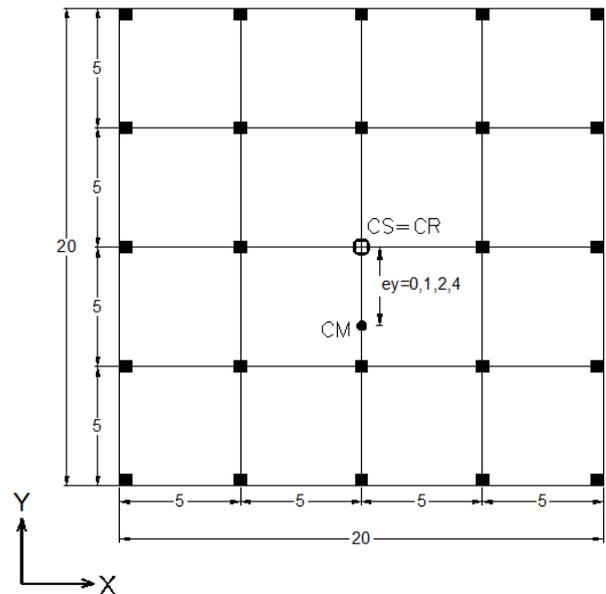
Typical Plan of buildings considered (units in meters)
